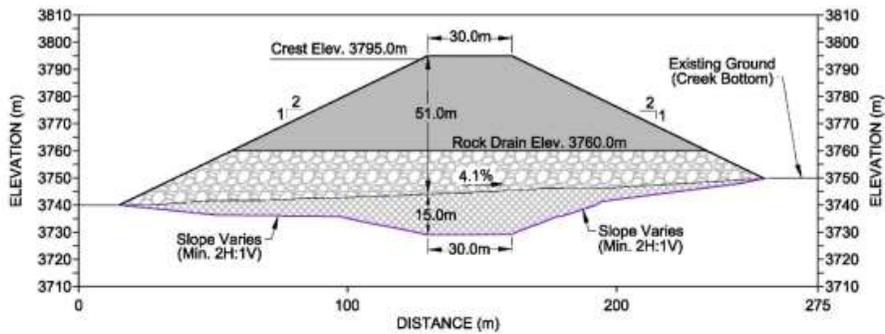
Typical cross sections through center of the conceptual Glacier Retention Structure
